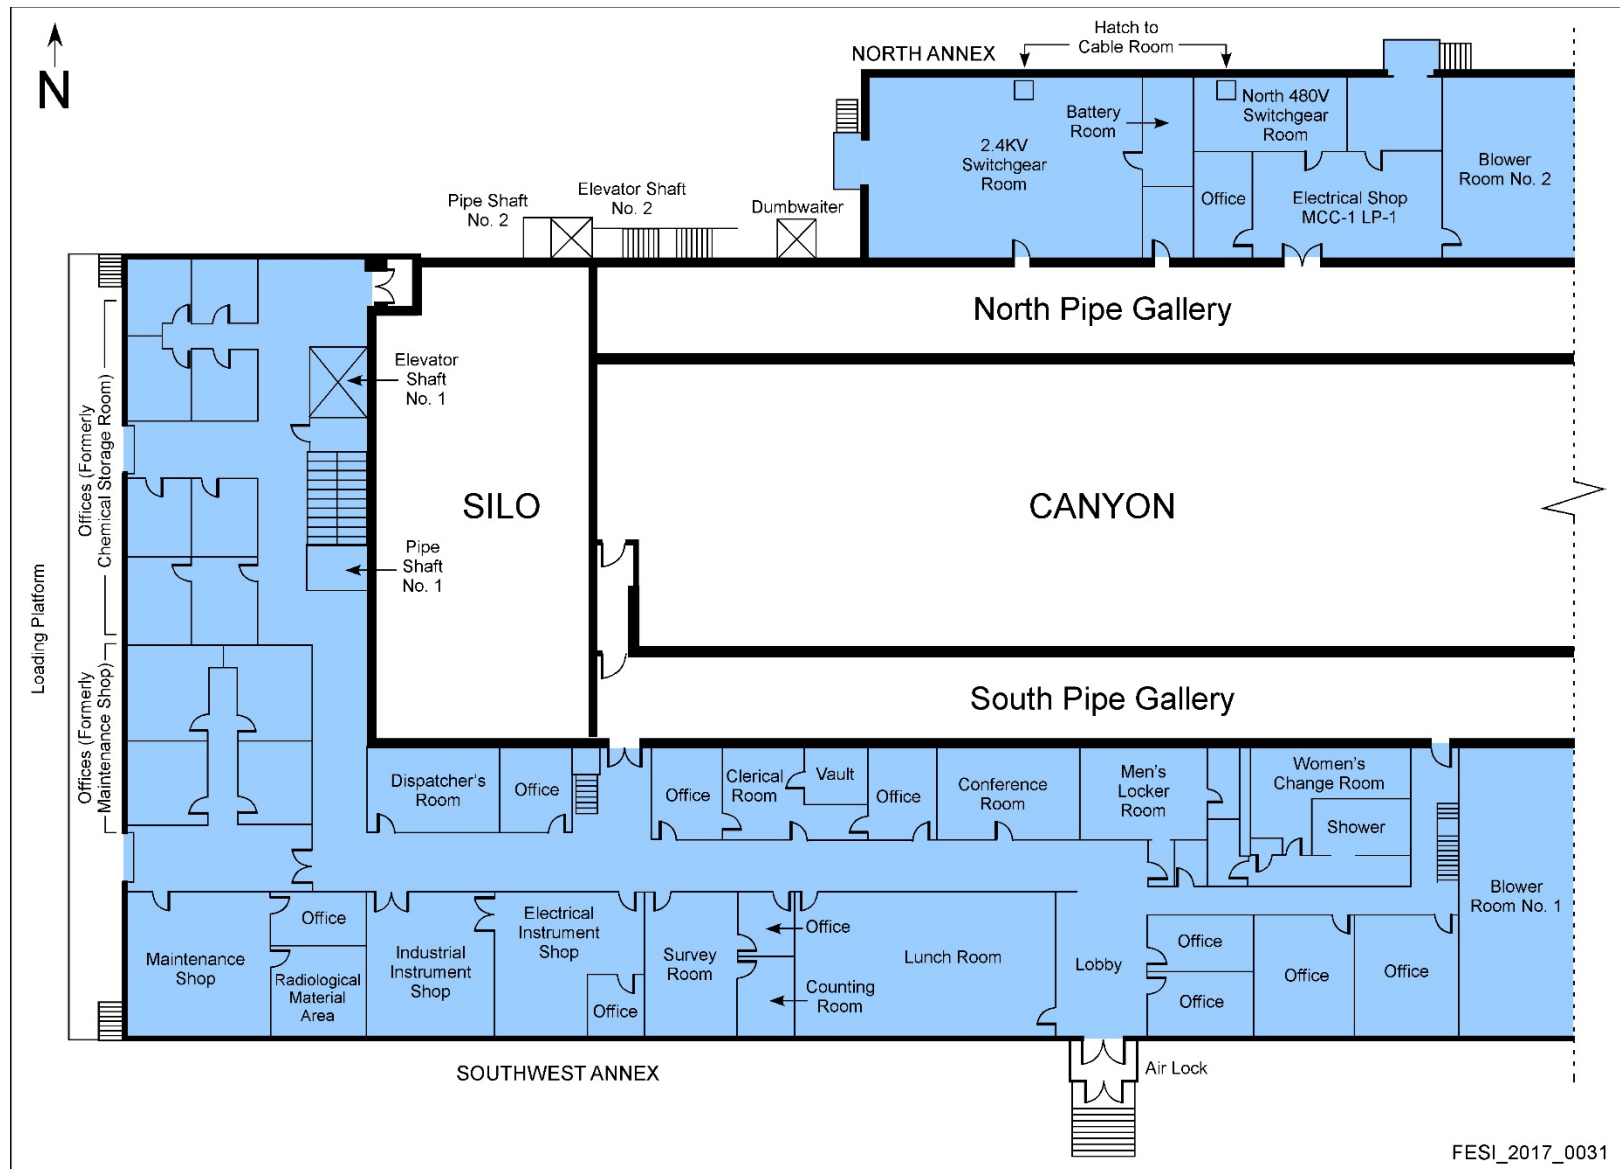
202S Annex Plan View at the Pipe Gallery Level – West End of Building
